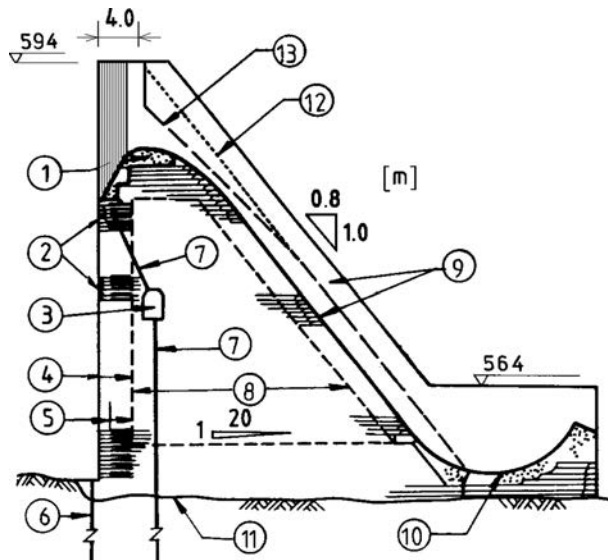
Cross-section of Copperfield dam (Australia). (1) Crest overflow made of mass concrete; (2) upstream surface of mass concrete; (3) drainage gallery; (4) roller-compacted concrete, type I; (5) bonding concrete between layers of roller-compacted concrete; (6) grouting curtain; (7) drainage drill holes; (8) roller-compacted concrete, type II; (9) lining of mass concrete; (10) reinforced concrete sill bucket; (11) foundation of granite; (12) originally anticipated slope at the non-overflow part of the dam; (13) executed slope – 1:0.9.
